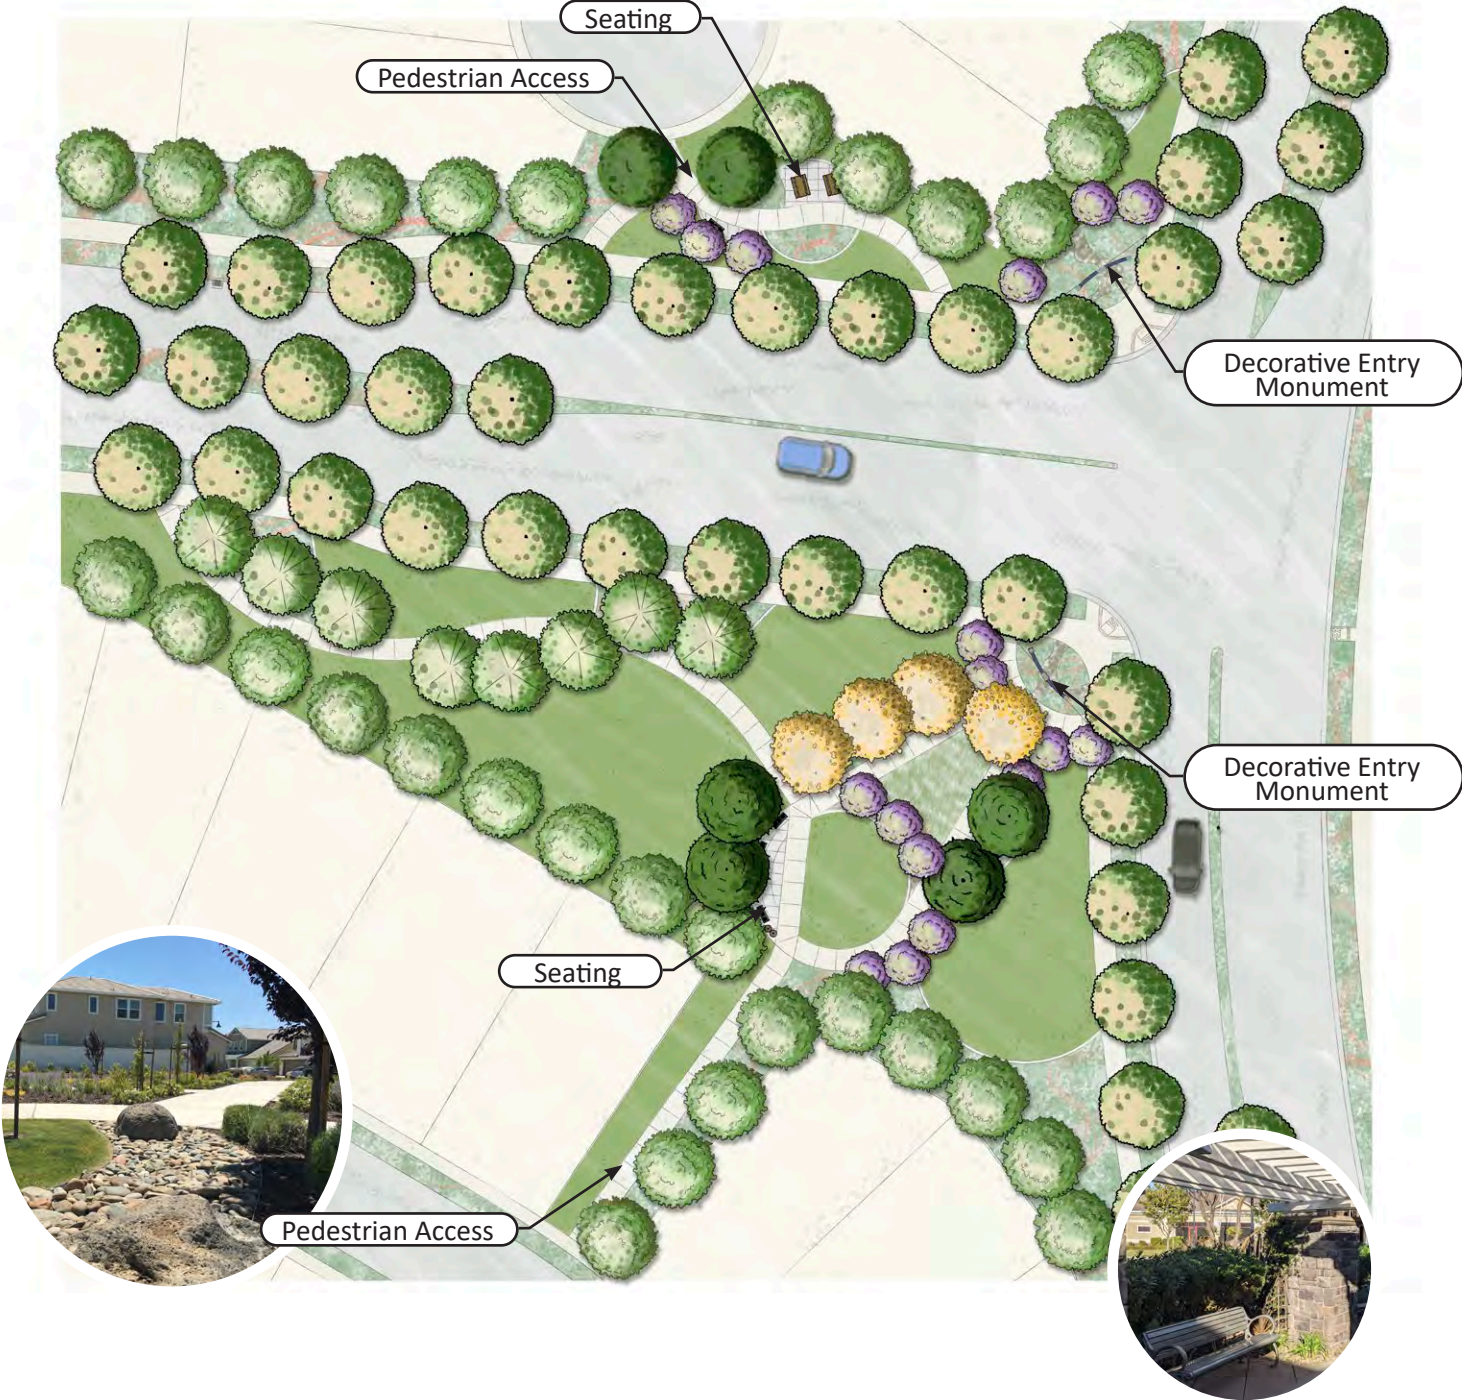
CAMBAY AND BRIARSTONE LANE GATEWAY CONCEPT PLAN
